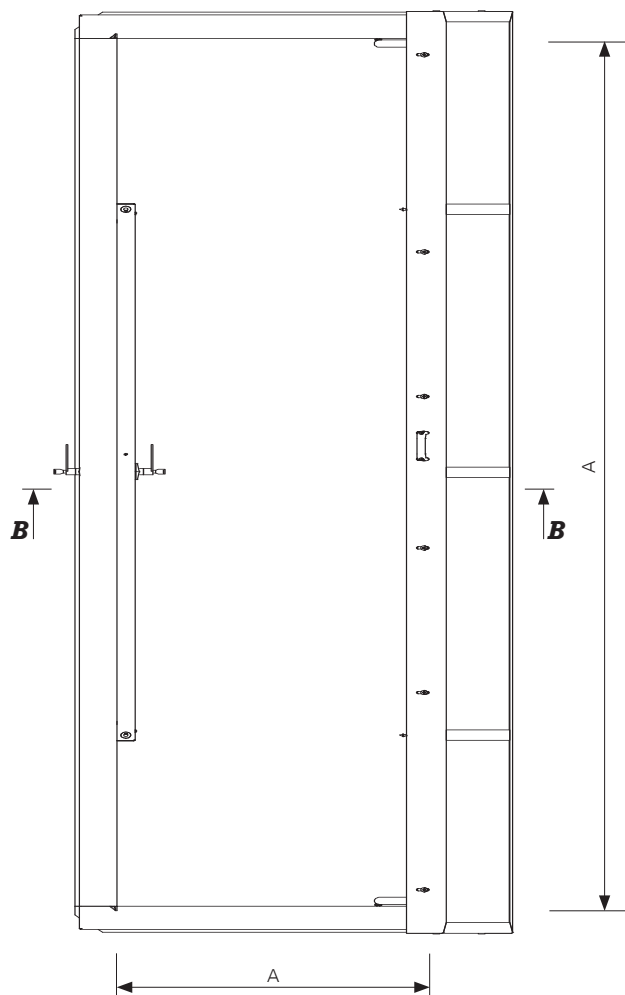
Top view of mcr PROROOF ST roof hatch in open position (over stairs), dimensions in [mm]
